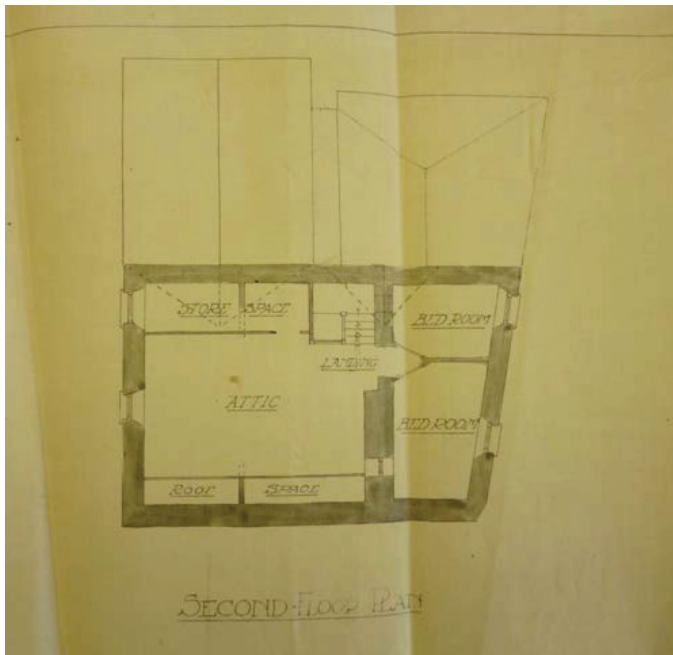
(left): Proposed second floor plan (CAC(B) BSRDNL/3/189 1921)
